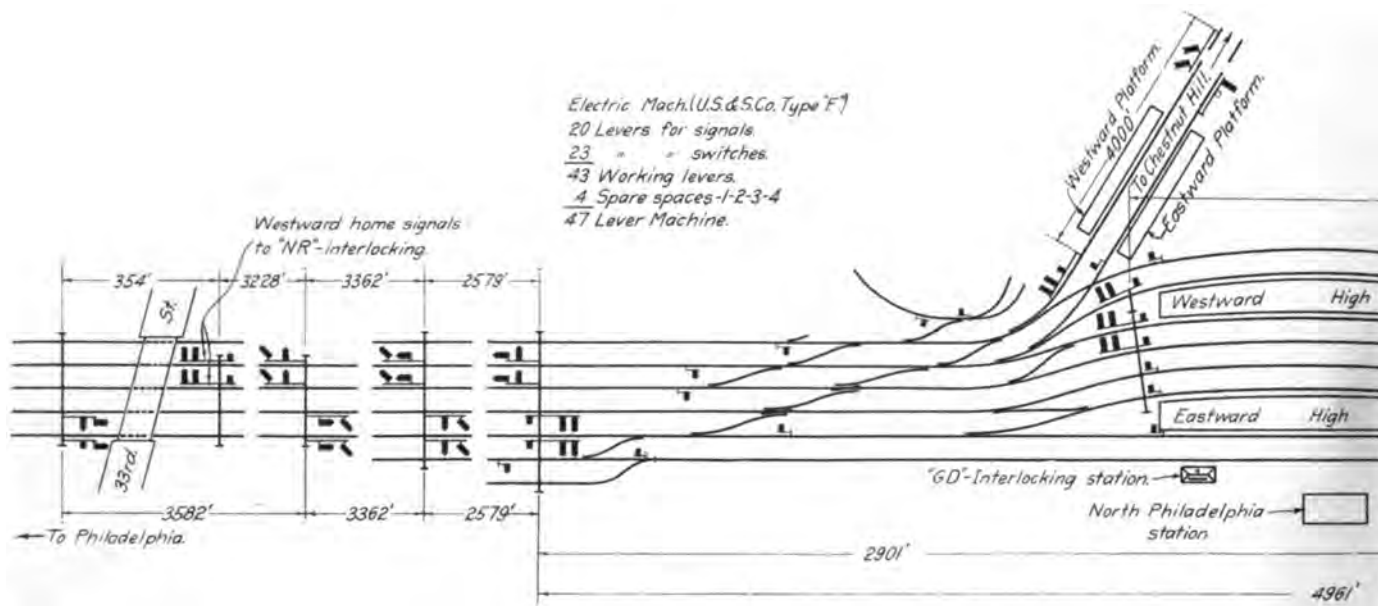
Track Plan and Signal Location at North Philadelphia (Continued below).
